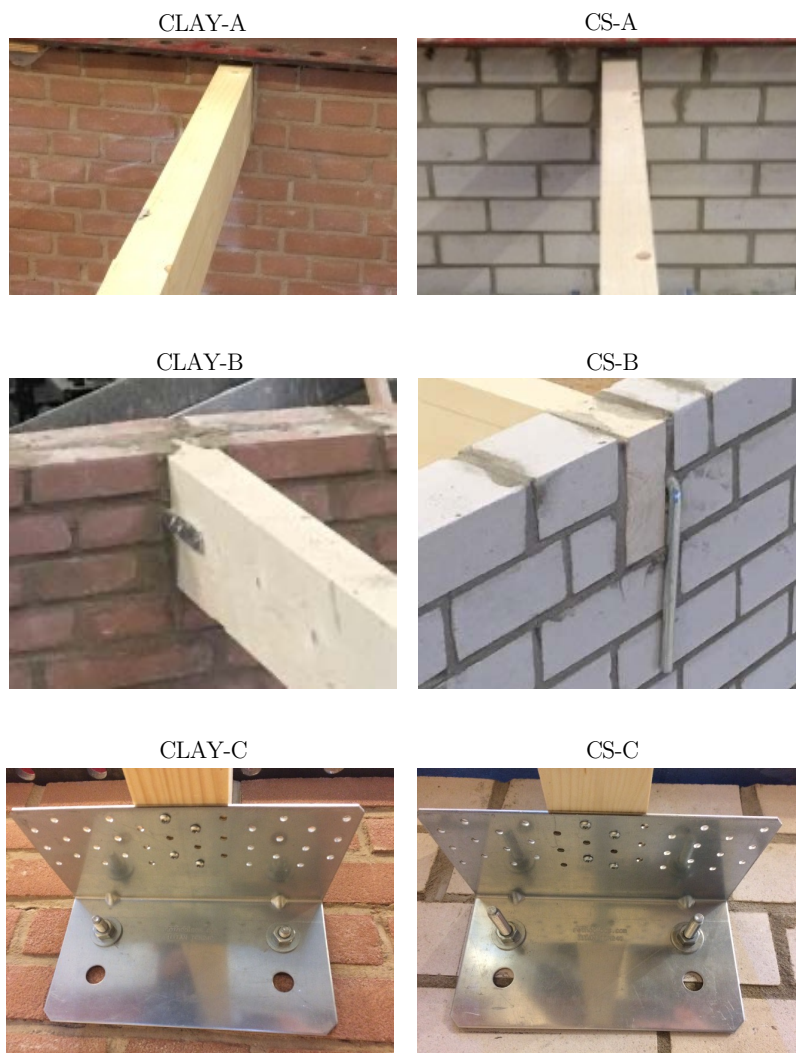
Configurations of timber-masonry connections tested within the pilot study: as-built with masonry pocket (CLAY-A and CS-A), as-built with hook anchor (CLAY-B and CS-B), strengthened with steel angle (CLAY-C and CS-C).
